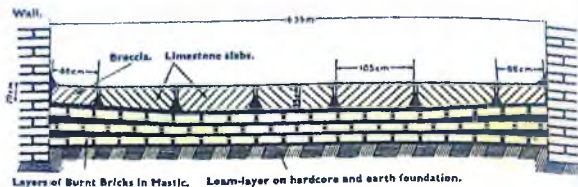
Section of the road Aibur Shabu at Babylon [Davey, 1961].
